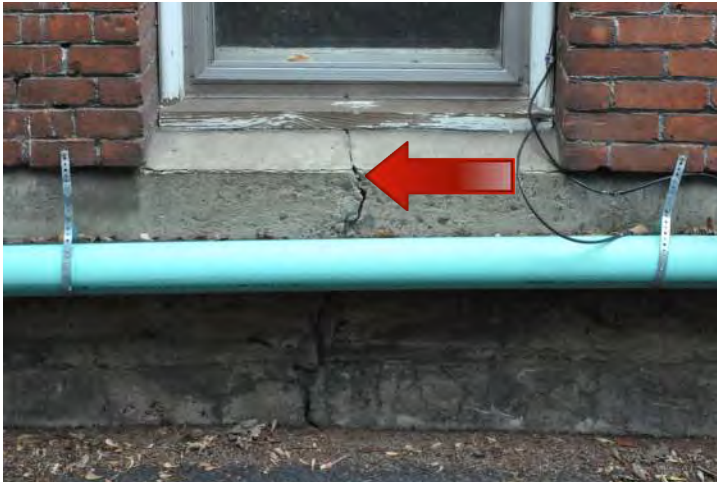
This crack in the concrete foundation located on the south side of the building, continues up through the brick to the top of the building. The crack is likely due to settlement of the foundation. Also note that the blue drain pipe is held by straps anchored directly into the brick units rather than into mortar joints. Locating anchors in mortar joints is less likely to damage the irreplaceable brick materials and is easier to repair in the future.
